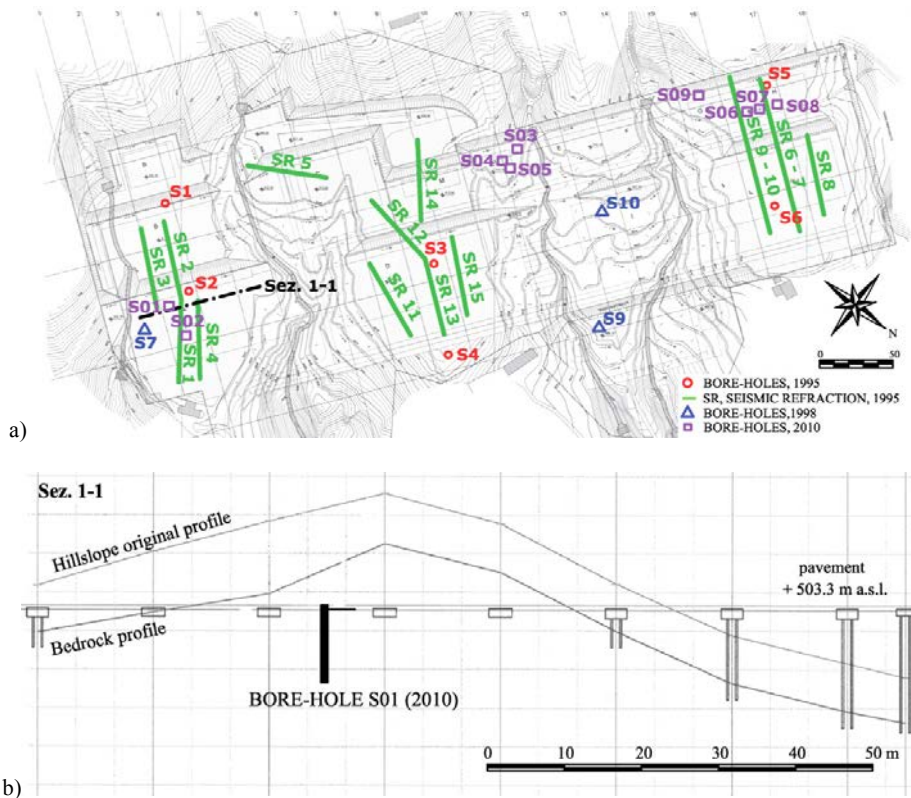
a) Plan view of the construction site after the excavation stage and location of bore-holes and geophysical tests; b) Cross section 1-1 with indication of the hillslope original profile, the bedrock profile and the foundation scheme of Building A1.
